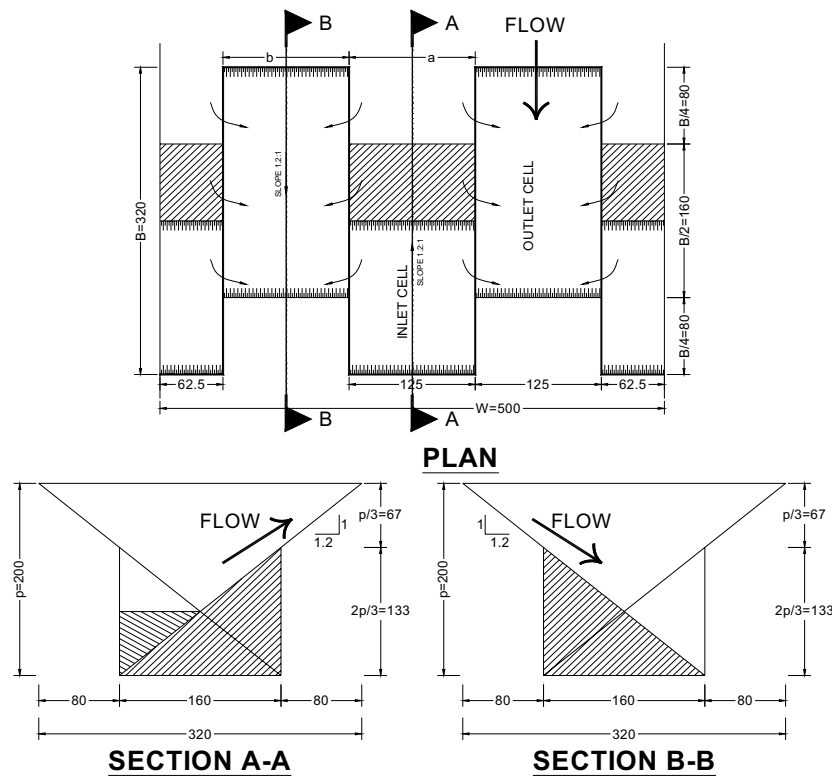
Plan and section of model P_2M_6 with filling inlet cell modification (dimensions in mm)
